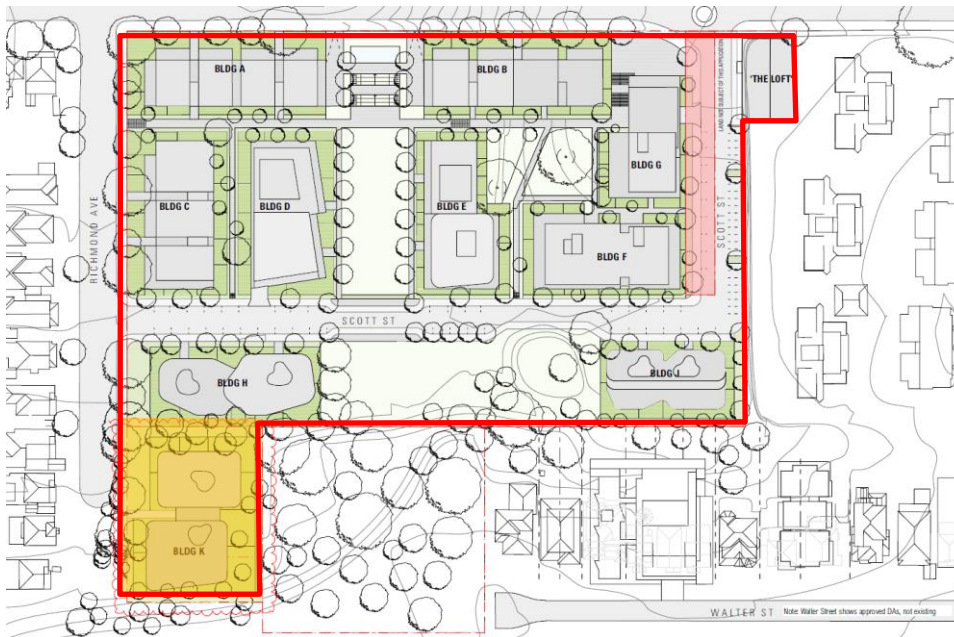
Plan showing the consolidated subject property outlined in red and the location of the proposed modification (transmission tower site and vacant land) shaded orange.
